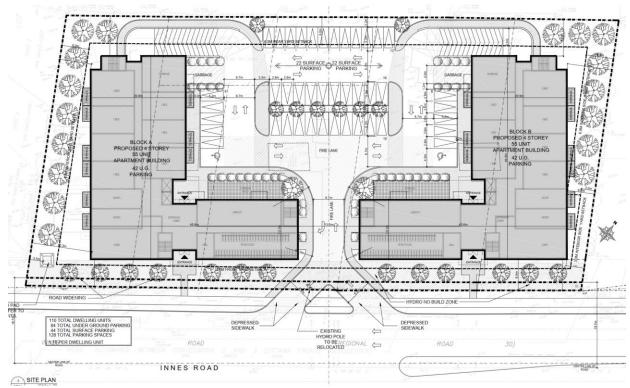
Site plan of 3817-3843 Innes Road.
